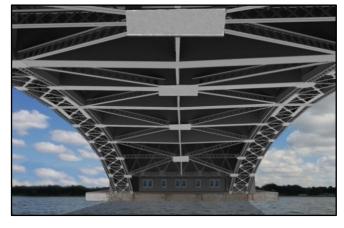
Conceptual rendering of the welded steel truss replacement structure proposed under Alternative 2 (Underside View)
